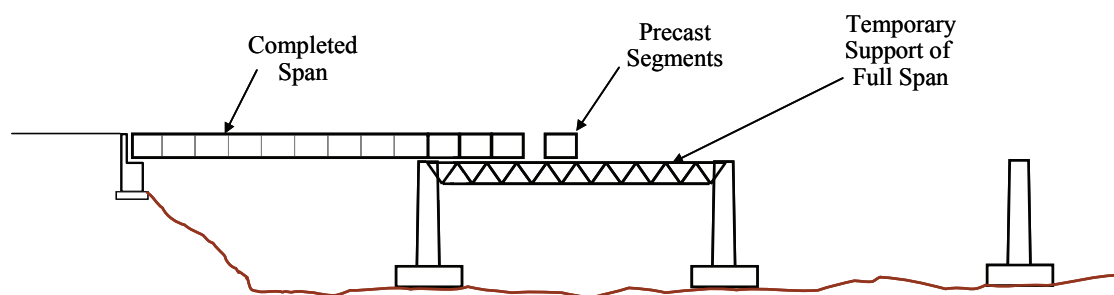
Schematic of Span-by-Span Construction with Precast Segments
